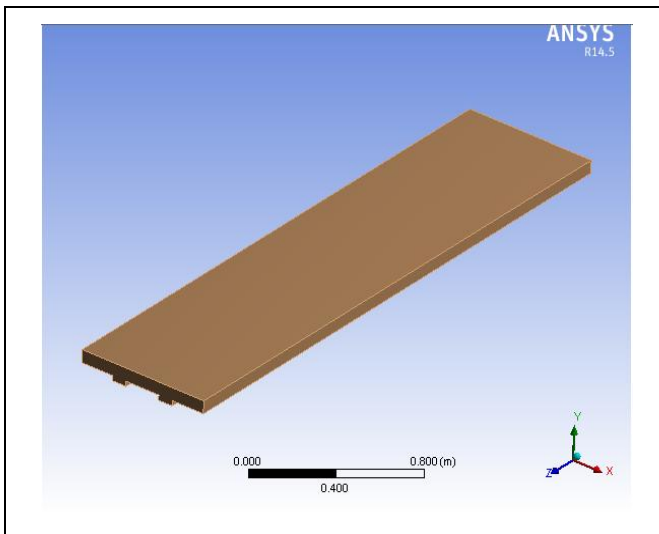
(A) Geometry of Bridge span with two stiffeners
